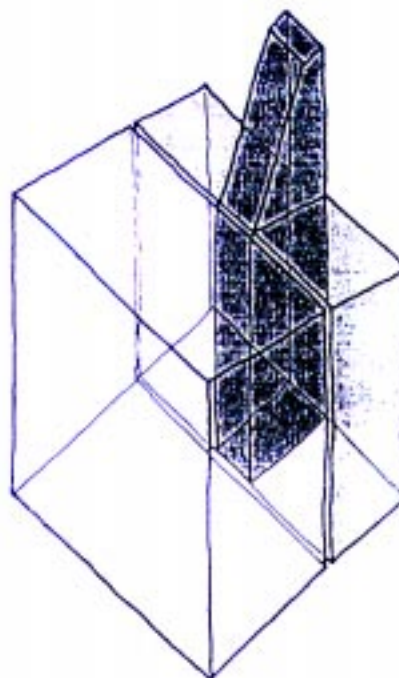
The chimney as a ventilation element used to spatially organise the house; vertical and without bends, and with the kitchen and bathroom located around the chimney.
